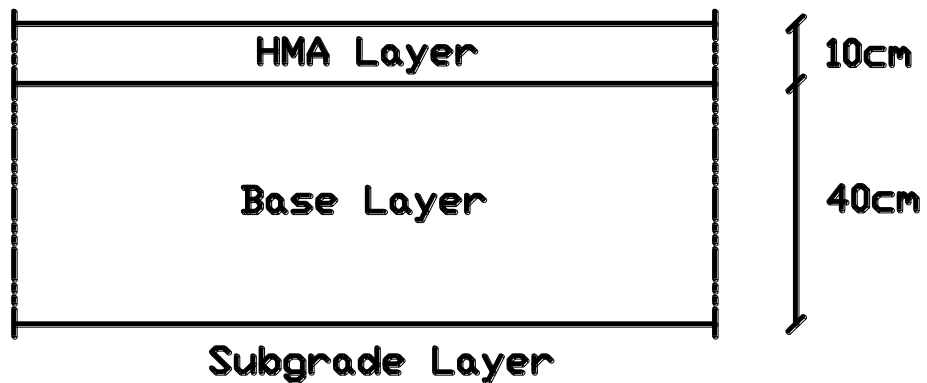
Typical Cross-Section for Pavement Used in Kafr El-Sheikh city
